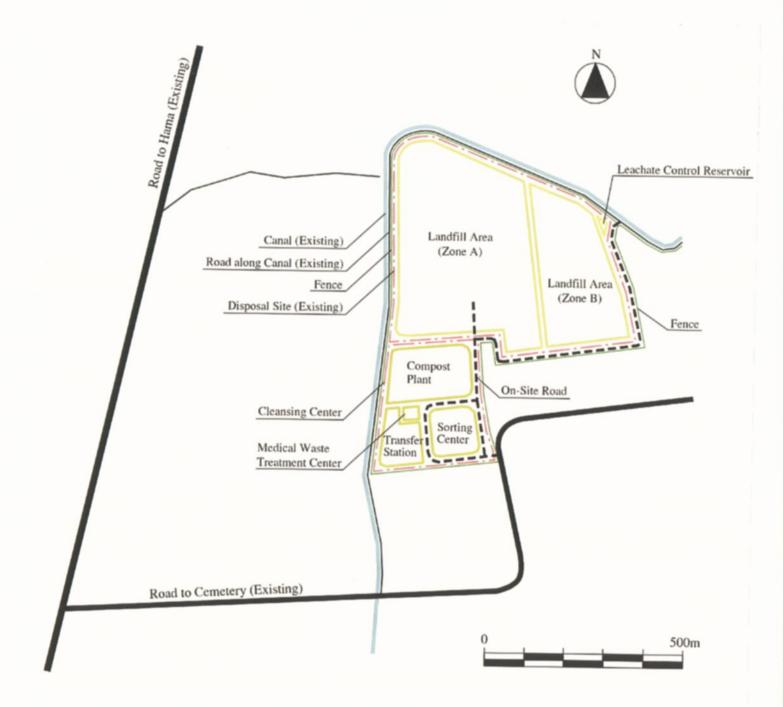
Layout Plan of Homs Cleansing Center
